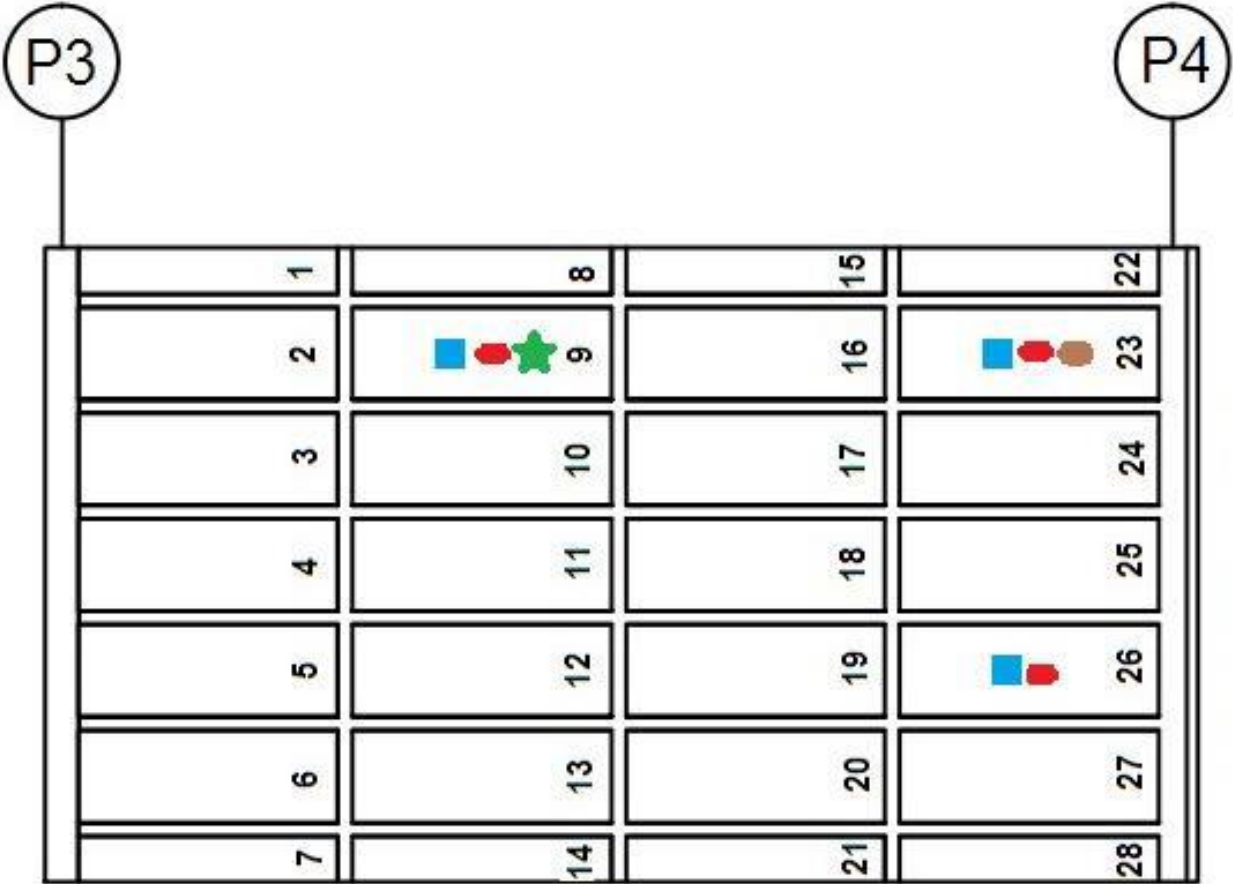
Test conducted at various locations between Pier P3 and Pier P4
